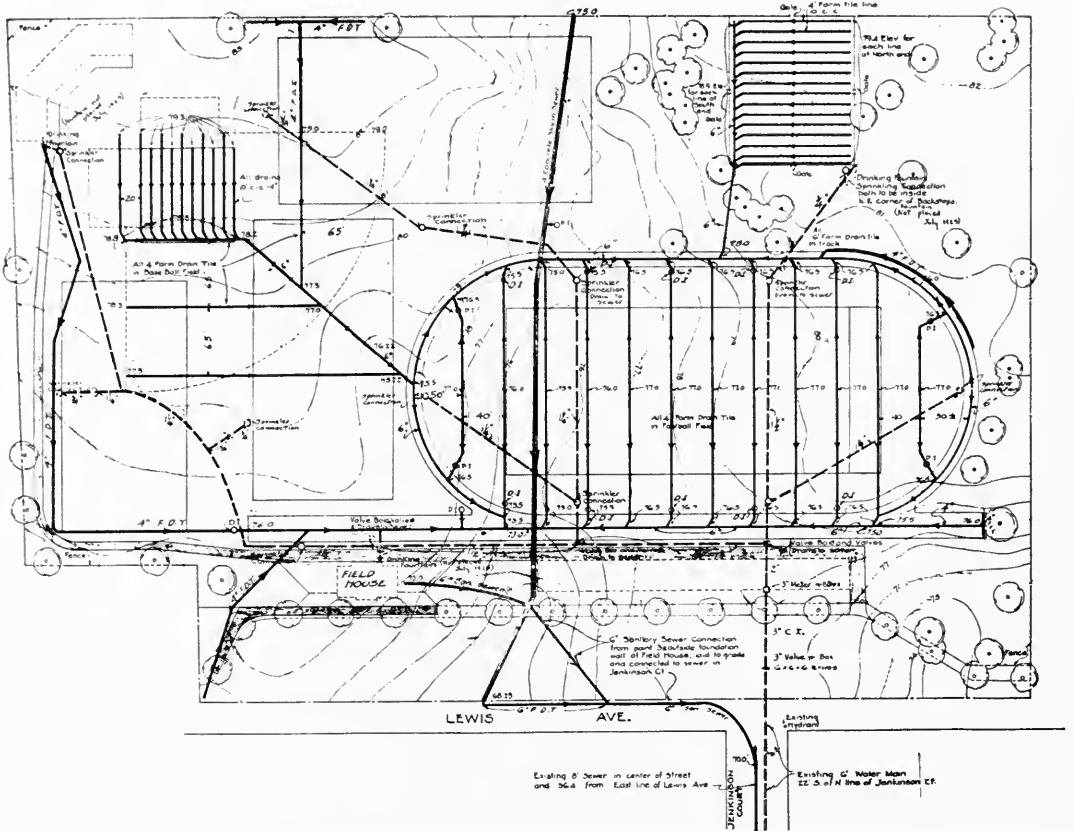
WATER AND SEWER PLAN, WAUKEGAN FIELD
